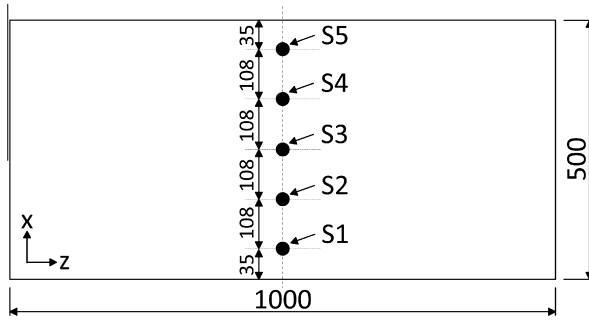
Schematic of strain gauge layout on panel (dimensions in mm).
